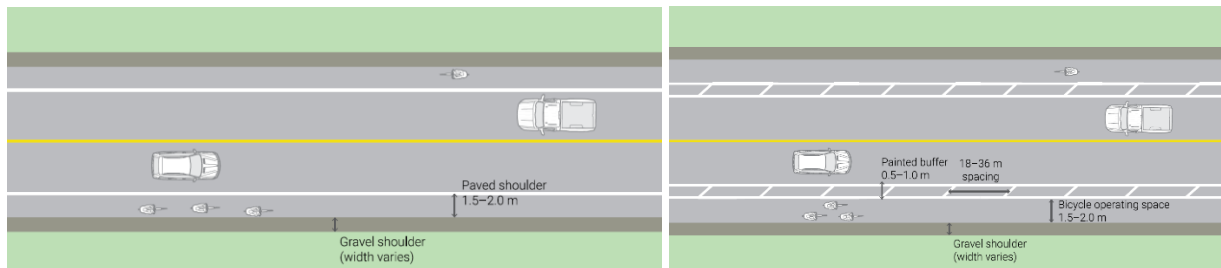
Typical Layout of Roadway with Paved Shoulders (Left) and Buffered Paved Shoulders (Right) (Excerpted from OTM Book 18)
